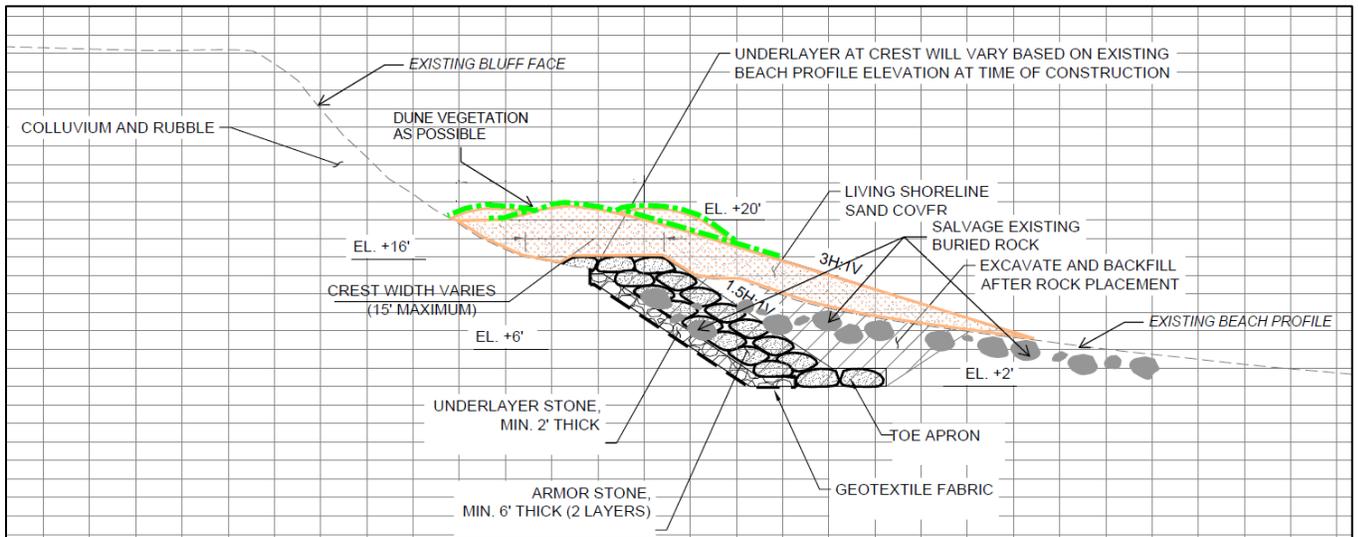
CONCEPTUAL PROPOSED STABILIZATION DESIGN – SOUTH LOT LOCATION
